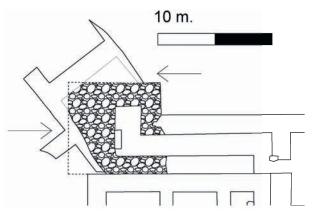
Details of Room 36 (north in the upper part of the image). The two arrows indicate where the stone foundations of the room above overlap the pre-existing walls of the Castle complex. The dashed line shows the suggested perimeter of the room.
